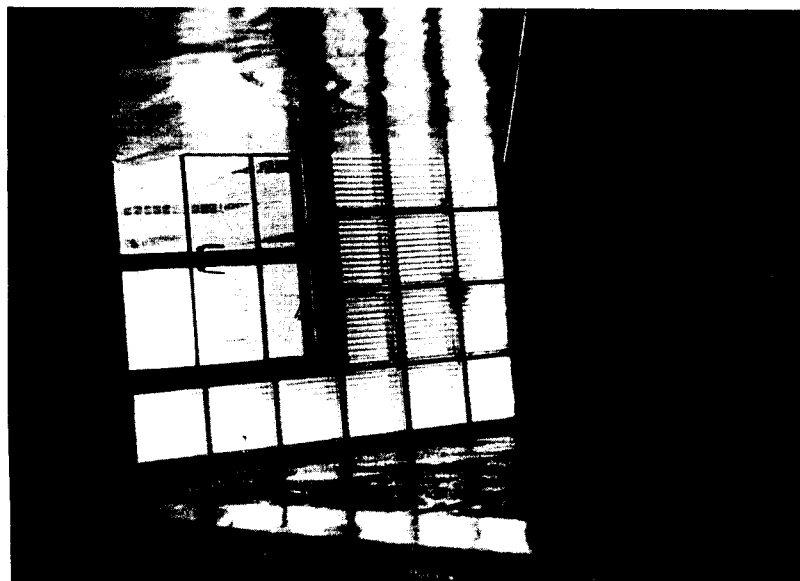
View from Inside Scissors Stairs at Breukelen. Photo shows landing and end wall composed of glass-block window. This glazed end wall, and its positioning adjacent to the street and entry area to the apartment building, provide an important degree of contact between persons in the stair and those outside. It also facilitates police patrol of the stairs, providing an important degree of visual surveillance. A removed stairwell light is usually read as a danger signal by patrolling police and is investigated. (Photo by author)
